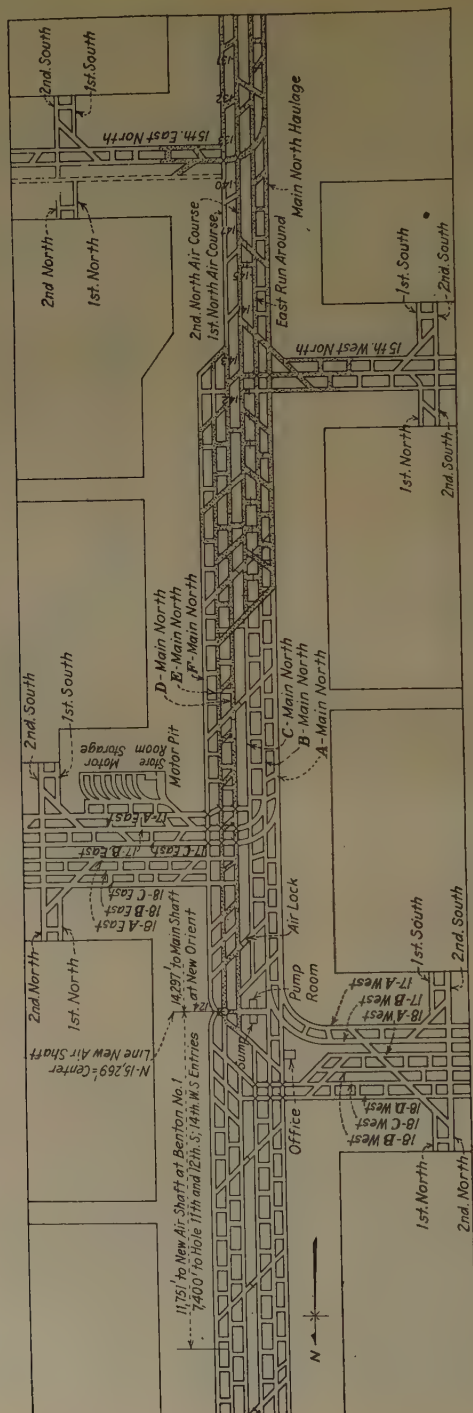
LAYOUT OF AIRWAY CONNECTIONS TO NEW AIR SHAFT.
